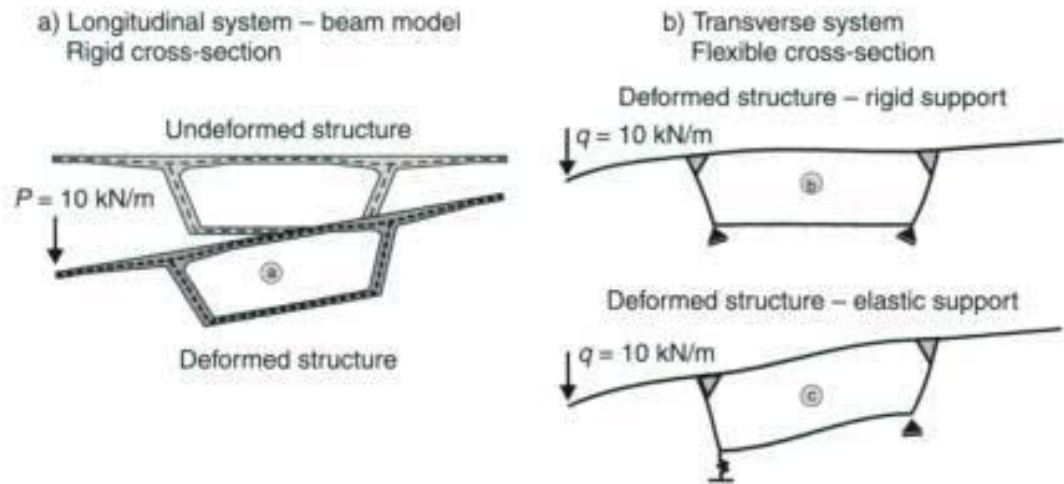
Distortion of a hollow box girder bridge at midspan; beam model (left) and real deformations (right, bottom)
